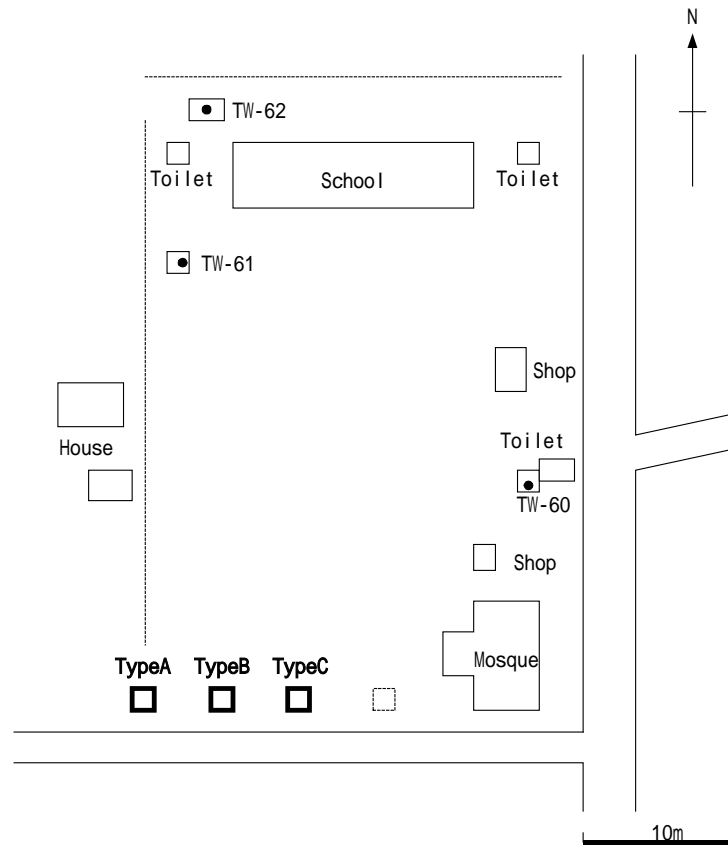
Arrangement of improved deep wells at Krishna Chandrapur
